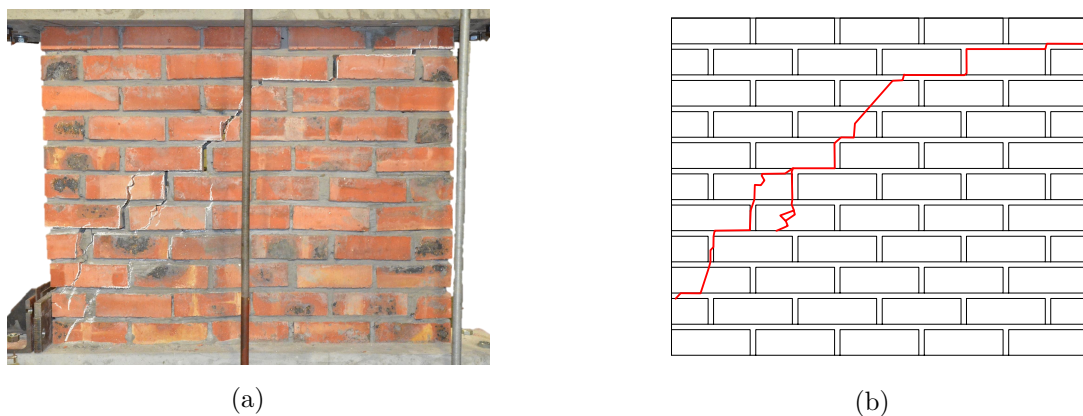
SW-110-0-2 (a) Cracked specimen; (b) Crack pattern documented
